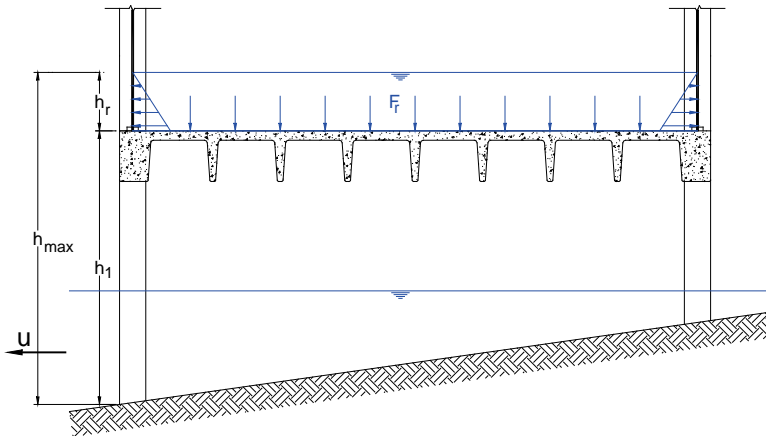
Additional gravity load due to retained water, F_r , exerted on an elevated floor during rapid drawdown.
